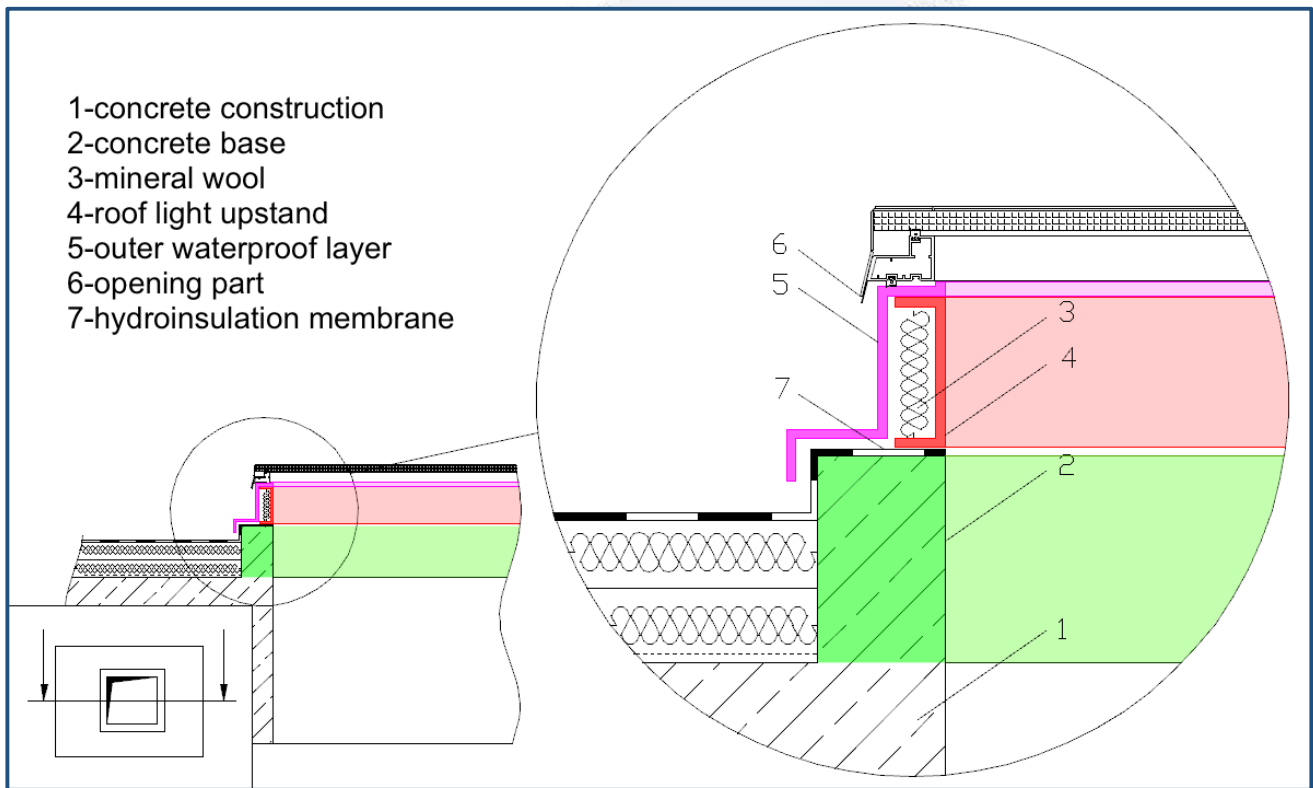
Installation scheme №4 - reinforced concrete roof/ base
